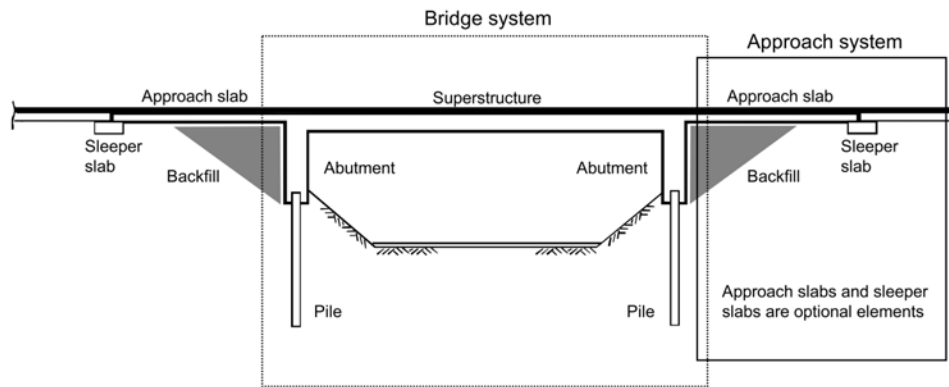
Simplified Geometry of an Integral Abutment Bridge [9].
